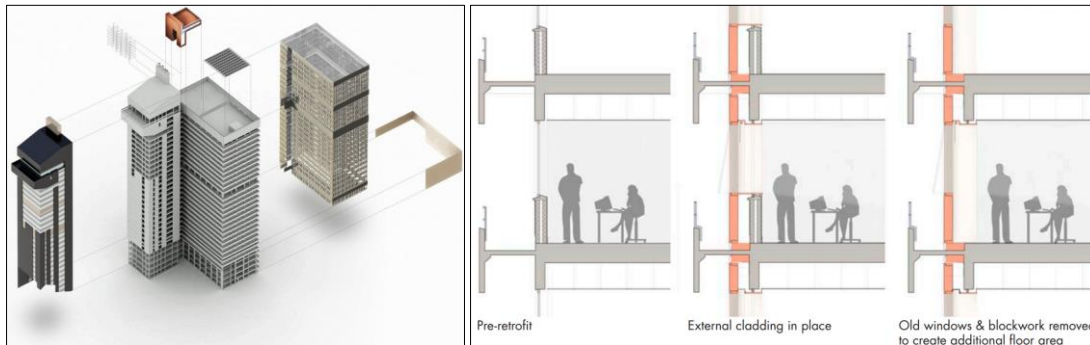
Guy's Tower in London, envelope replacement strategy (Source: <http://www.penoyreprasad.com/projects/guys-tower-external-retrofit/>. Retrieved at: 25.12.2017)
